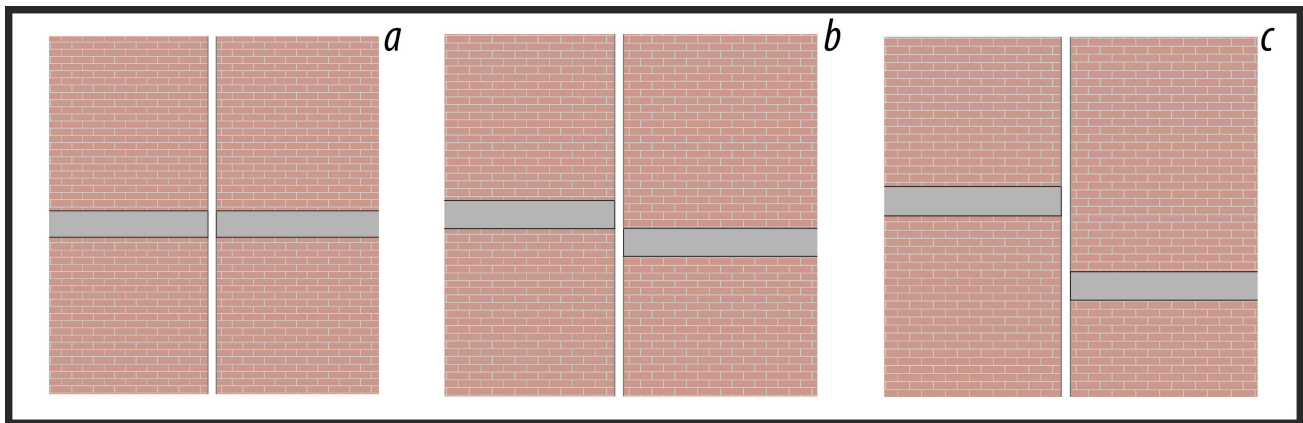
Floor levels in adjacent buildings: (a) Same, (b) Same (Limit condition), (c) Different.
